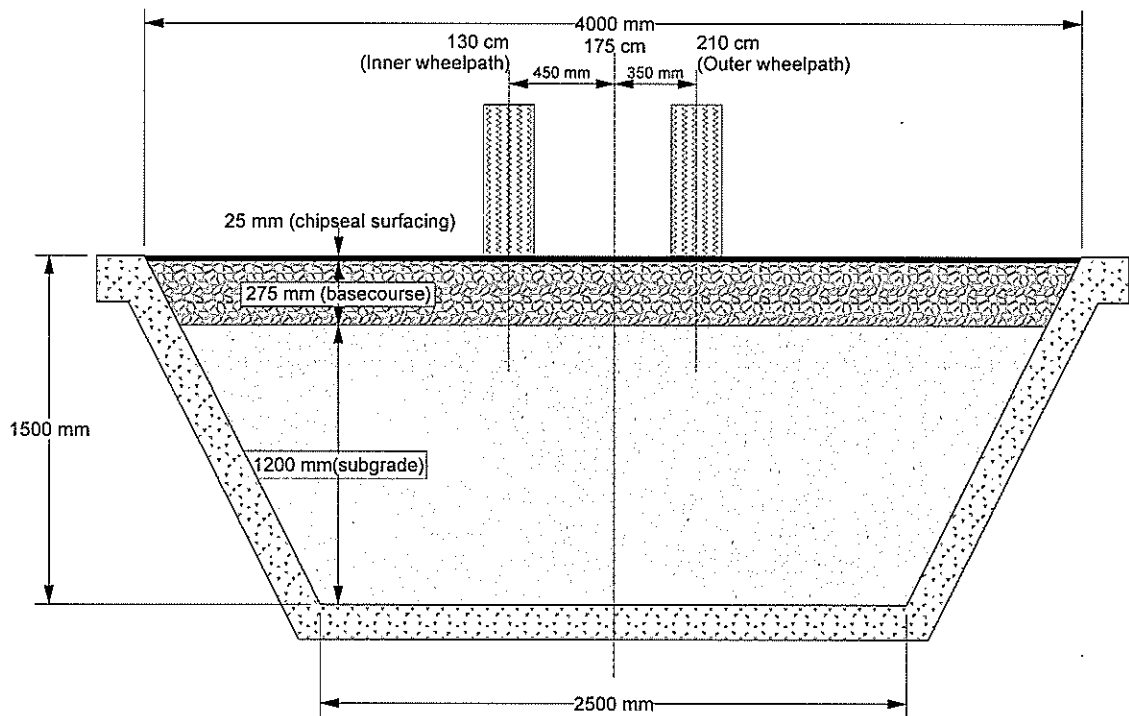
CAPTIF pavement cross section and wheel path locations.
